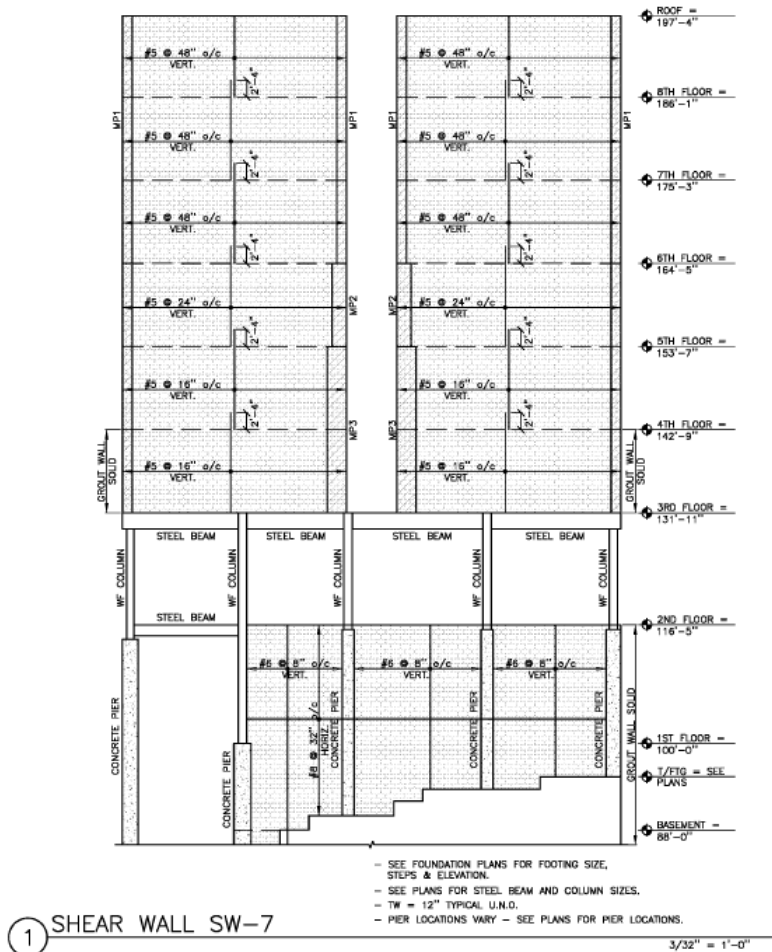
Shear Wall with Steel Moment Frames (S10.2 Drawing 1)
